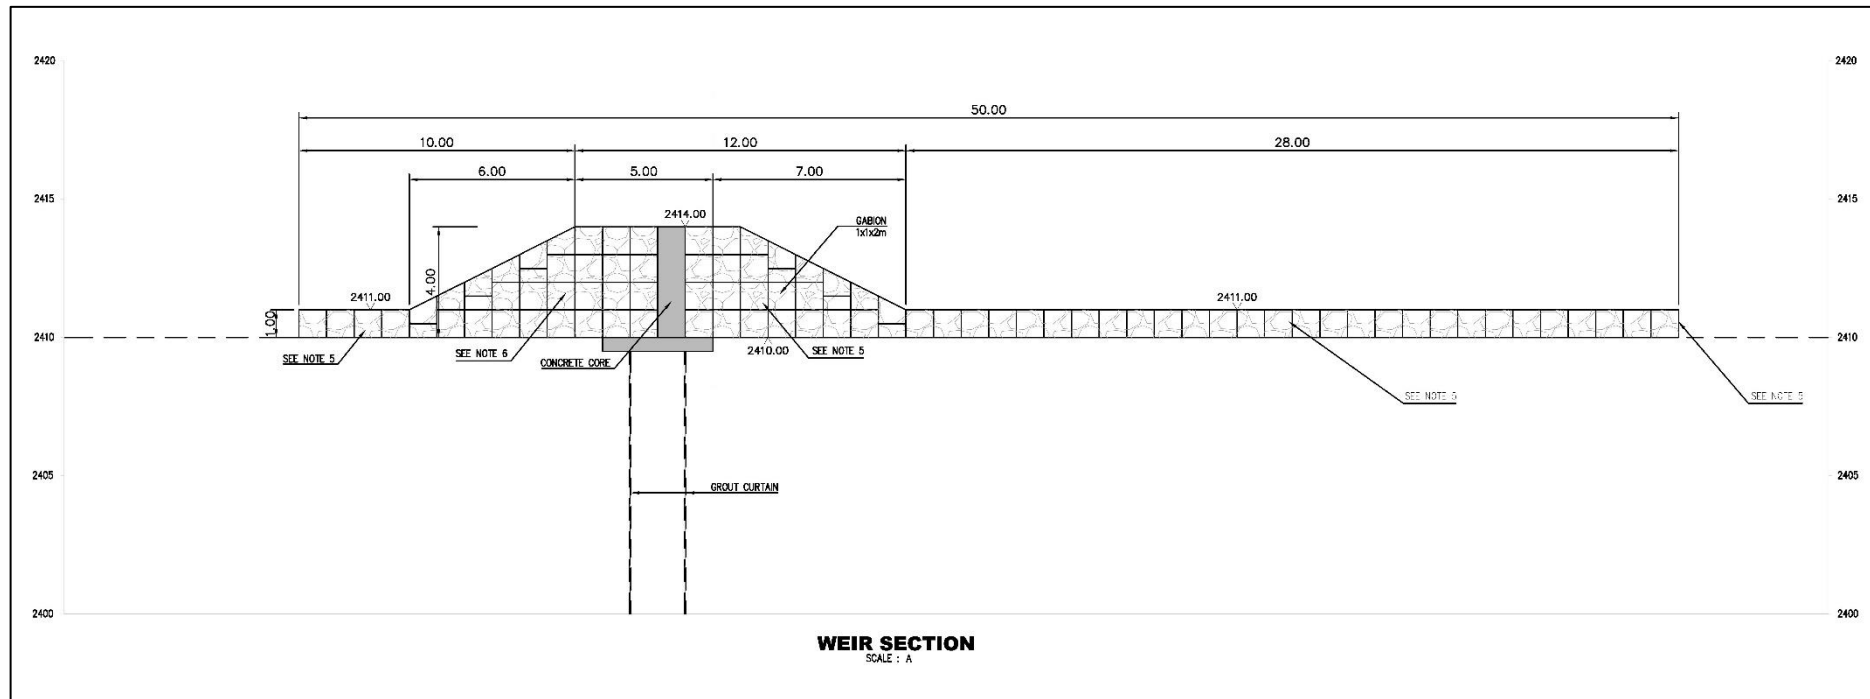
Proposed Flexible/Rigid Overflow Structure Longitudinal Section
